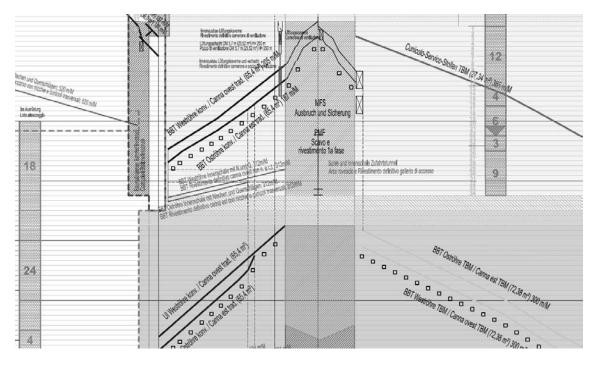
The Bergmeister plan – detail (source: The Brenner Base Tunnel website [bbt]).
